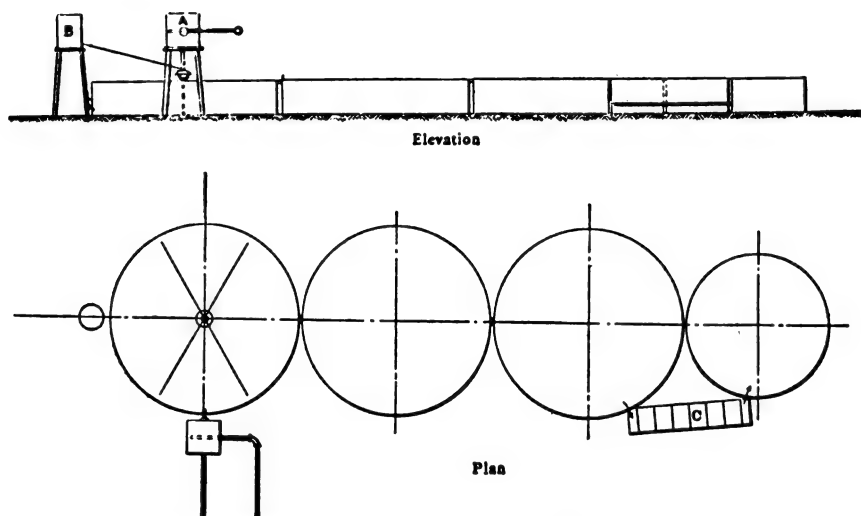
GENERAL ARRANGEMENT OF WATER-SOFTENING PLANT.
